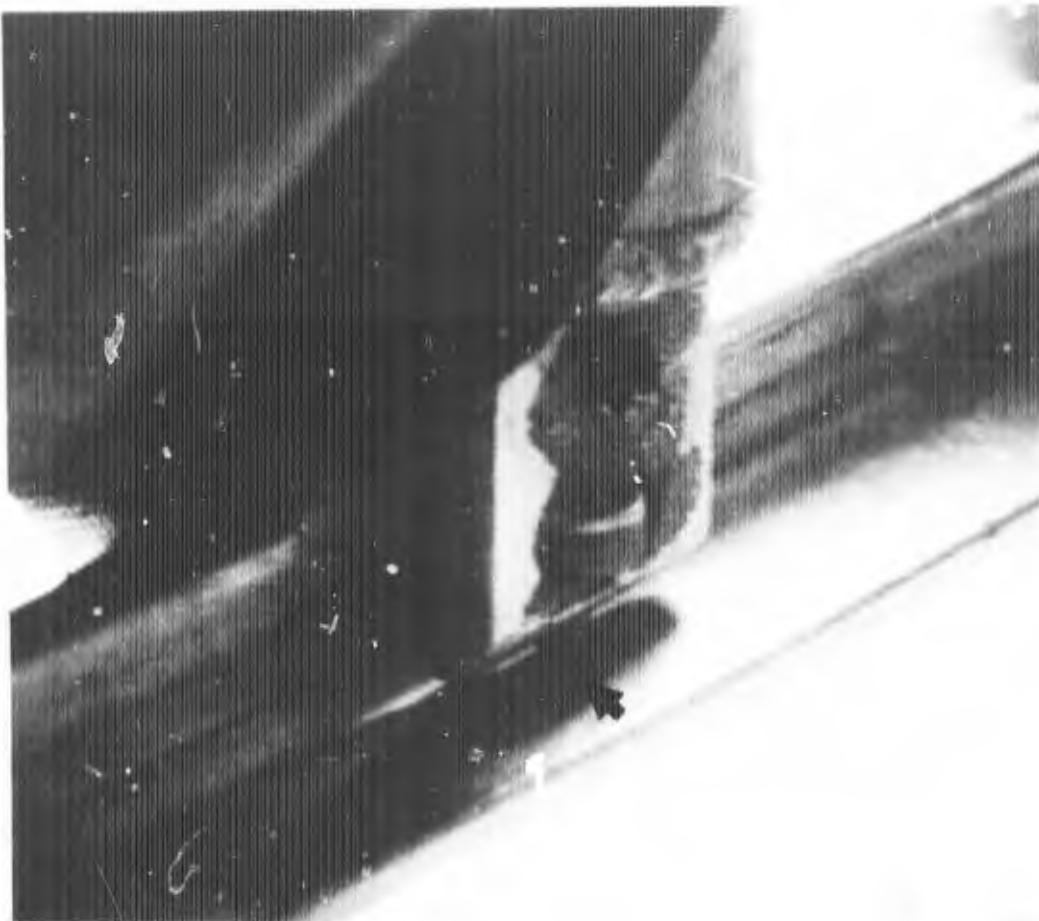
Screw Coming Out of Roller on Lower Guide Rail, Metal Door
